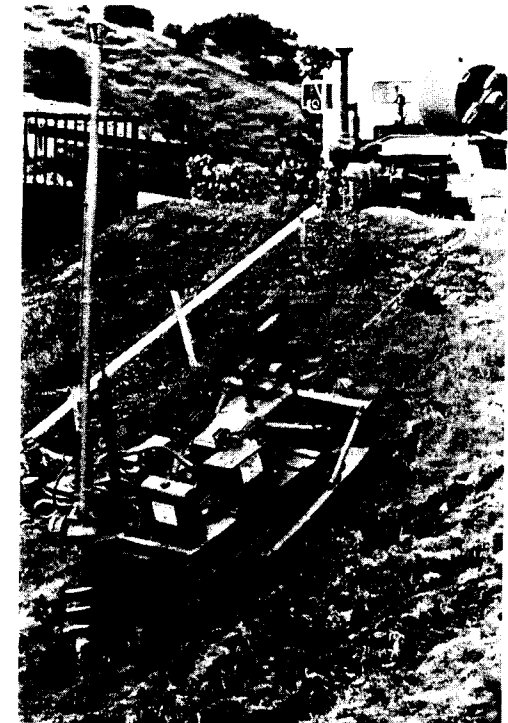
Small track-mounted drilling rig capable of working on a hillside (ADSC: The International Association of Foundation Drilling).
